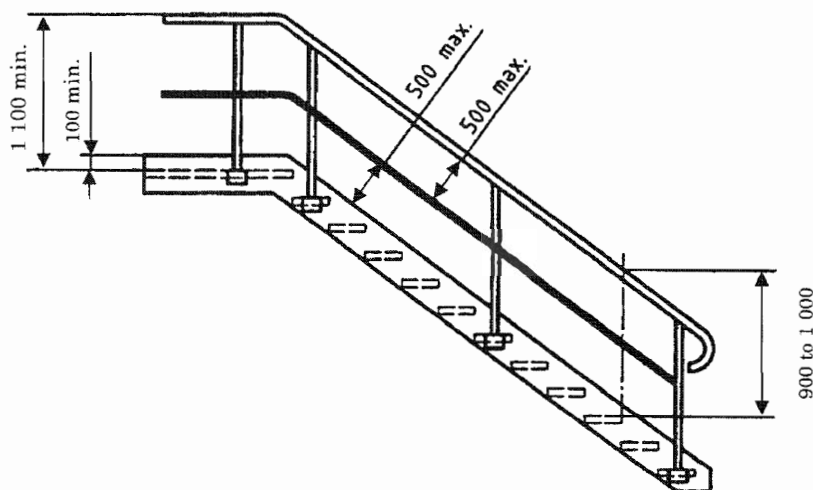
Example of a stair guard-rail and its continuation to the horizontal guard-rail
